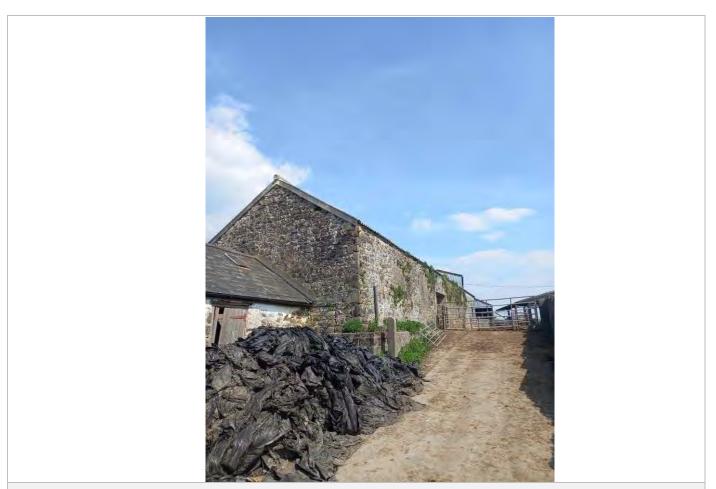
Piles of rubbish mostly made of plastic hay bail wrapping. Manure and muck present on concrete floor. Farm buildings in poor condition.
